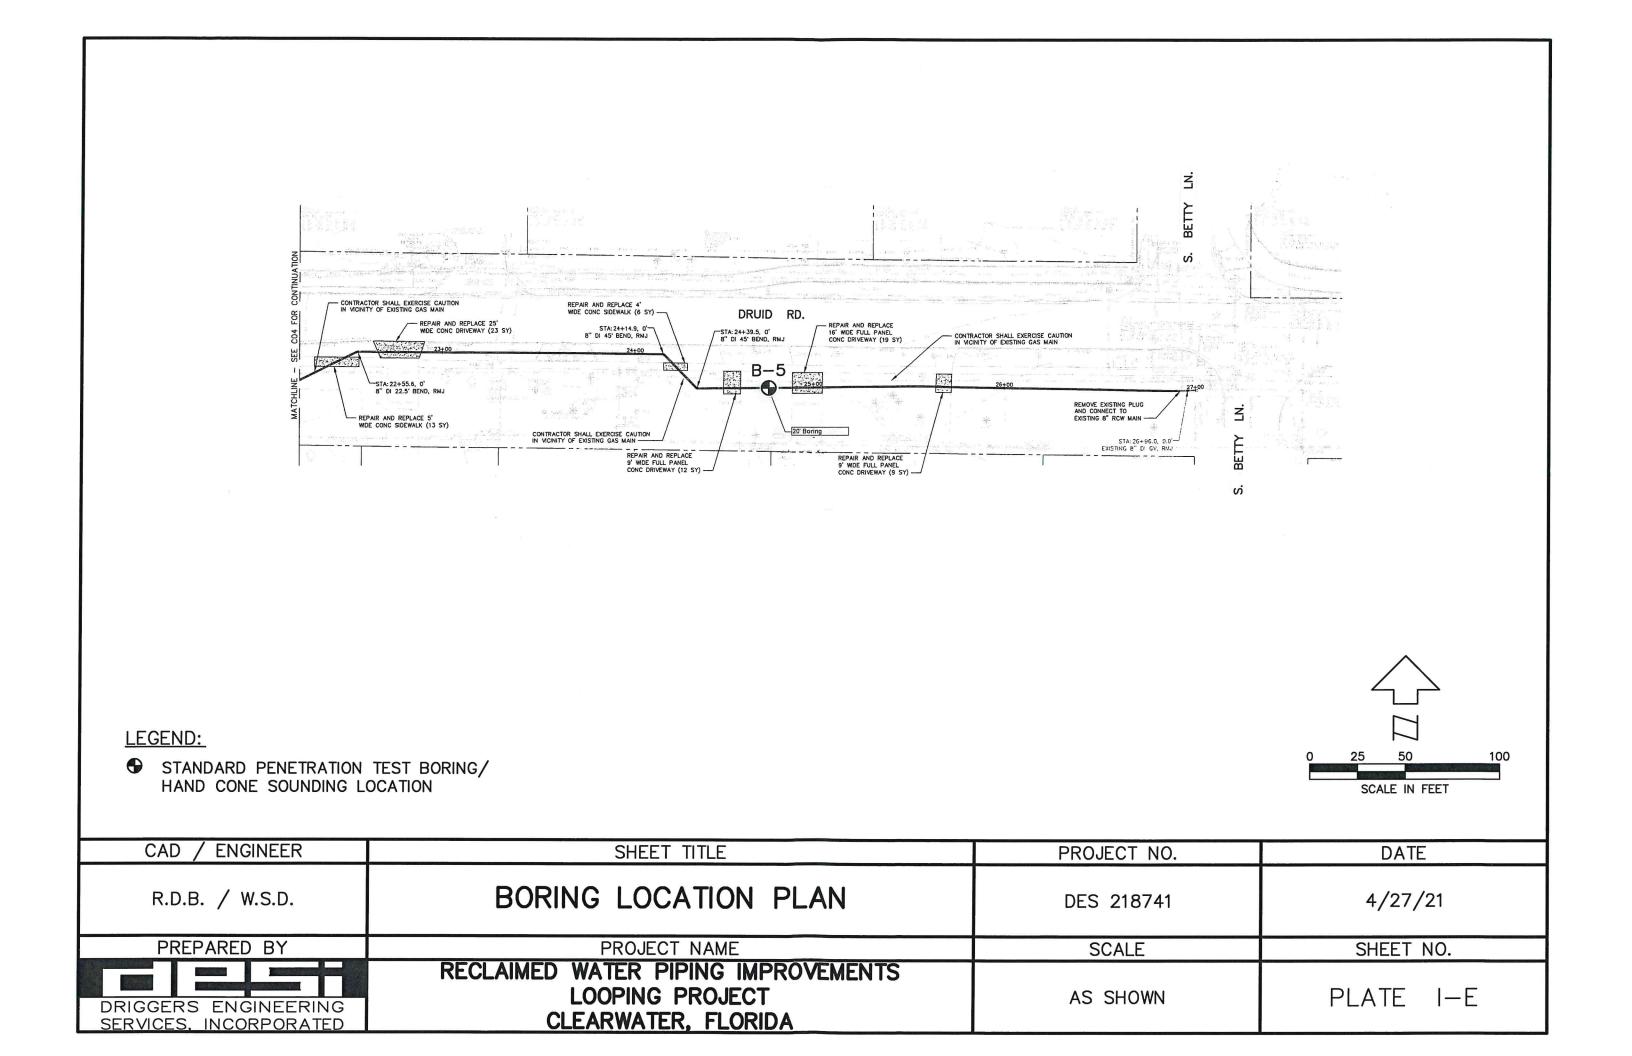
PLATE I-A THROUGH I-I – BORING LOCATION PLAN
